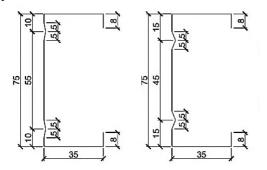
Specimens dimension, LB (left) and PC (right) [37]
